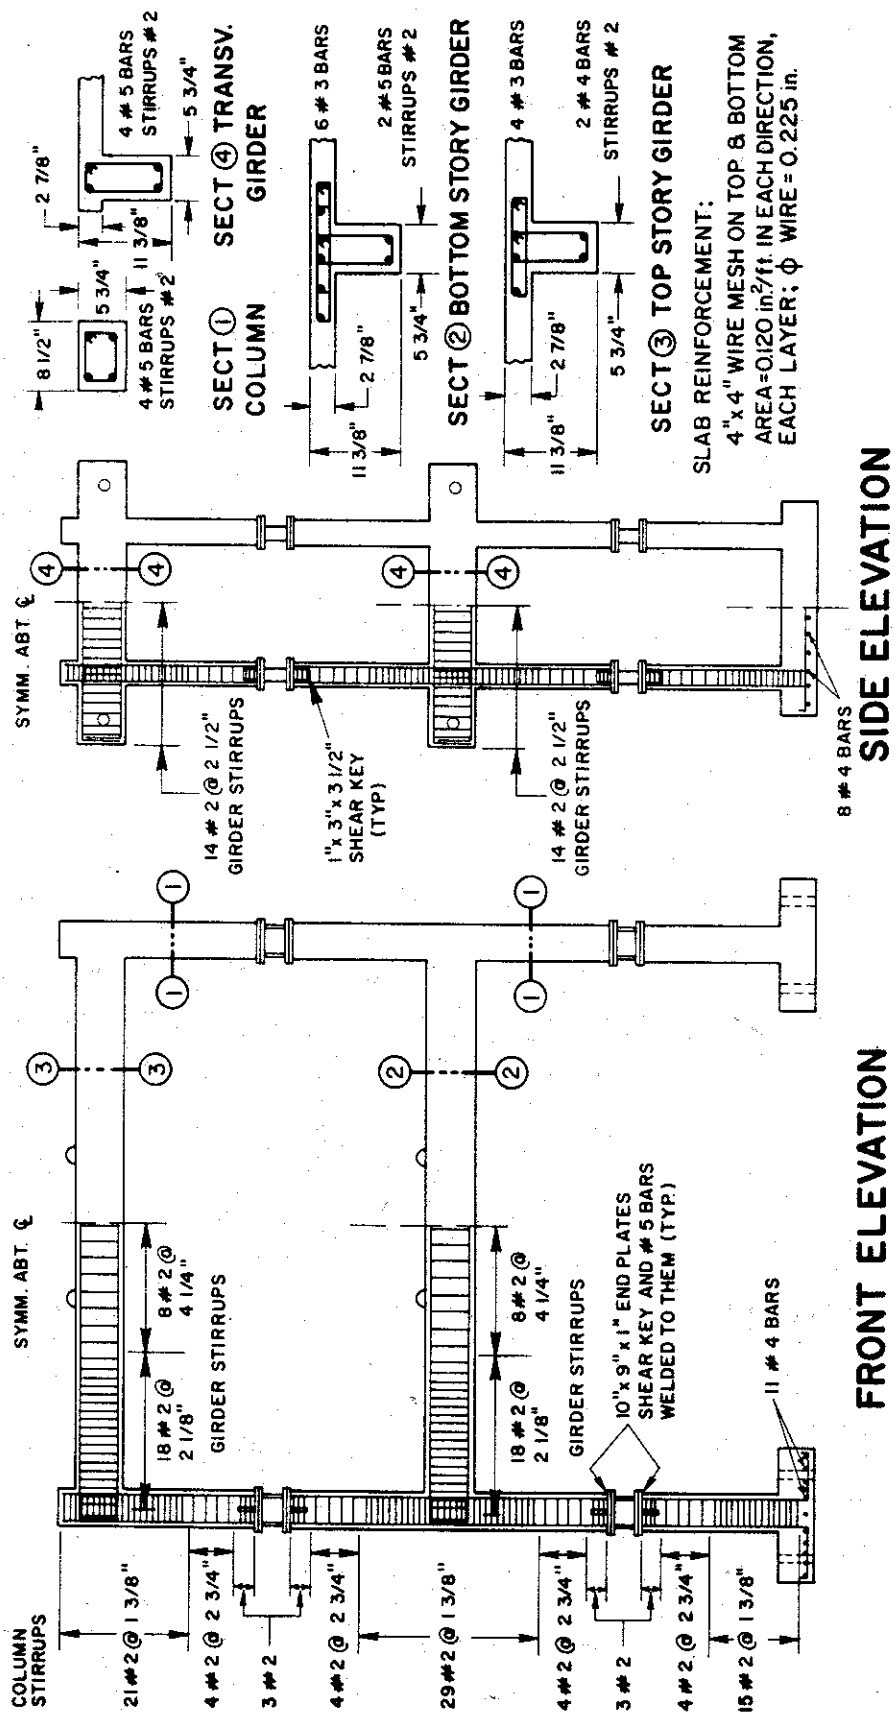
REINFORCEMENT DETAILS OF RCF2 SPECIMEN BY CLOUGH AND GIDWANI (1976)
